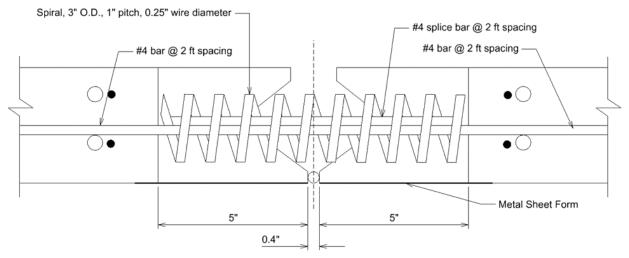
NU continuous precast prestressed panel reinforced pocket detail
